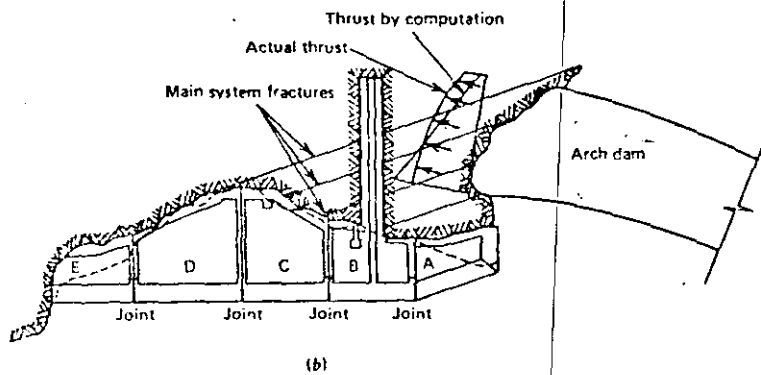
Reinforcing structure for the abutment of Canelles arch dam, Spain. [Reproduced from Alvarez (1977) with permission.] (b) A horizontal section.
